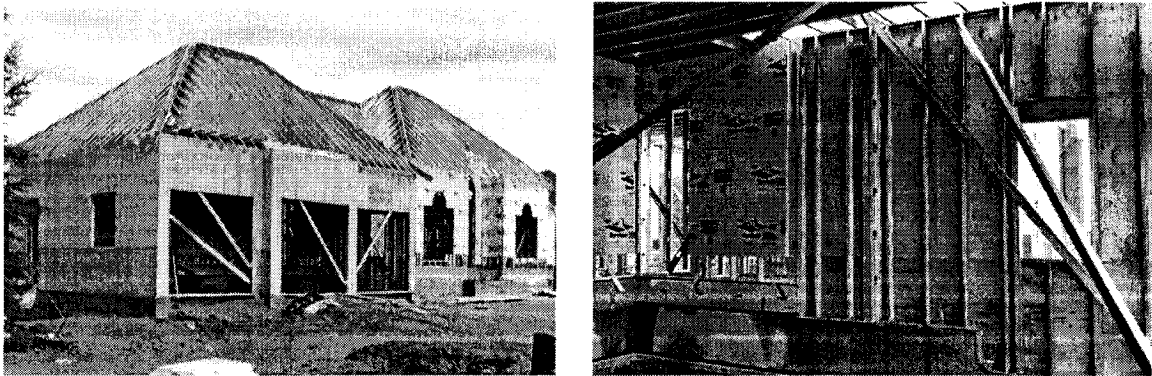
Light gauge steel stud wall using platform framing technique (left: exterior view; right: interior view of side wall)
